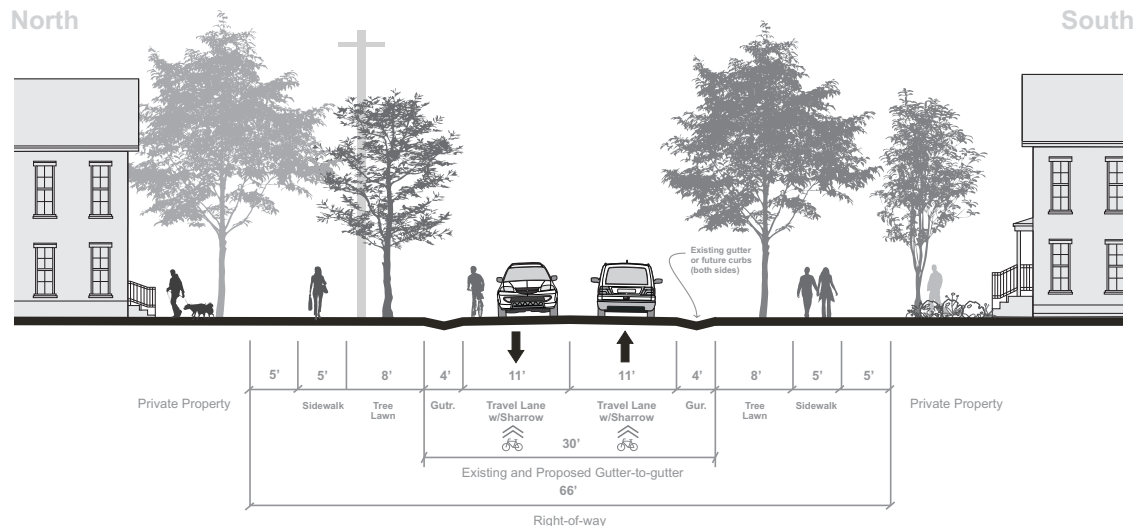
West Main Residential District Alternative 1 Cross Section
